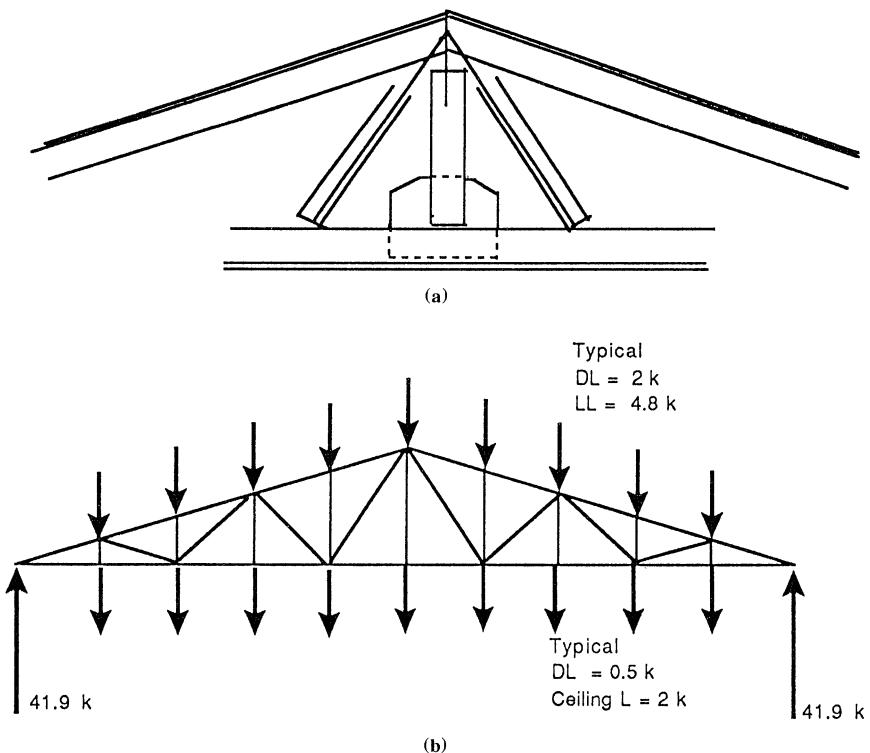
Member direction cosines for truss system. (a) Truss connection. (b) Truss loading.
